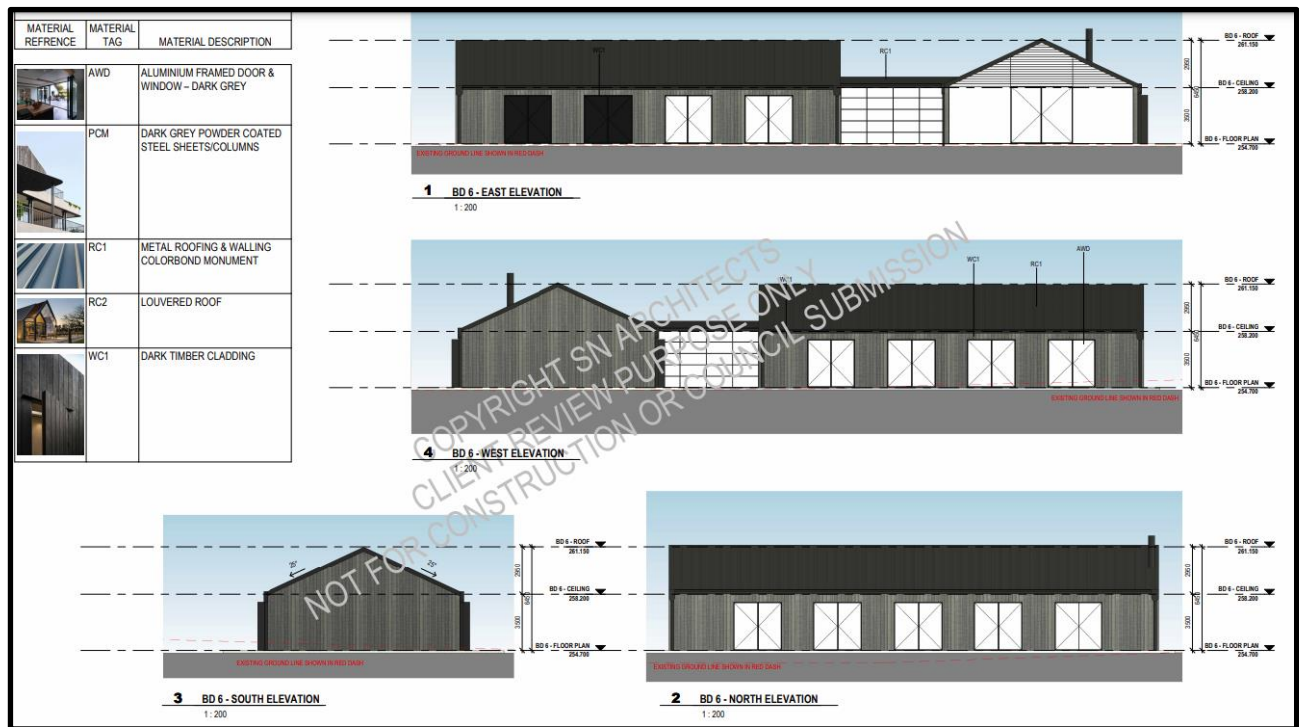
Brewhouse Elevation Plan (Source: SN Architects)
